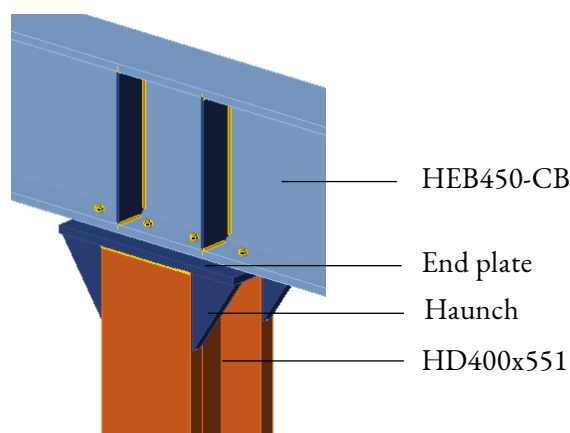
Connection between the continuous roof beam and the main column including haunches (own illustration made with IDEA StatiCA)
